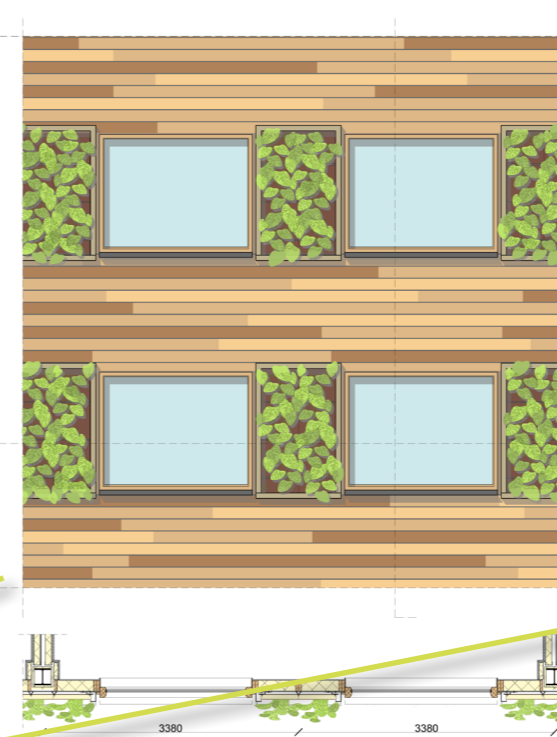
Lower risk façade view and sections with LWS 2. Drawn 1:20 scaled to 1:100 (Own work)
